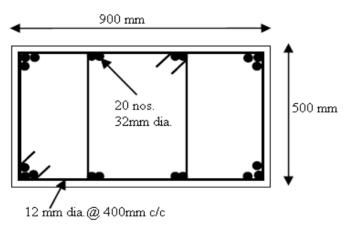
Cross section of the NSC column- ordinary detailing 400 mm stirrups spacing
